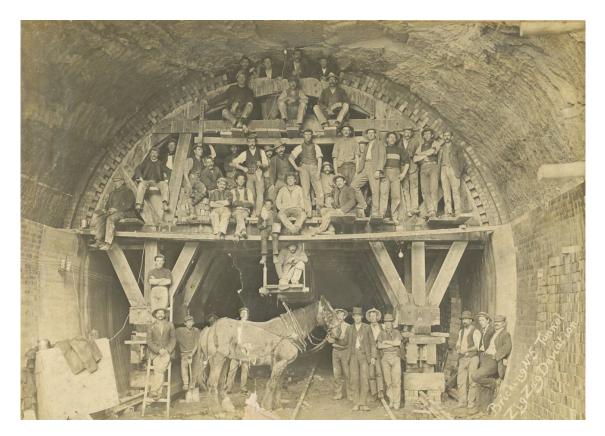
Workers during construction of Great Zig Zag Railway deviation tunnels (Source: Lithgow Library Learning Centre)
